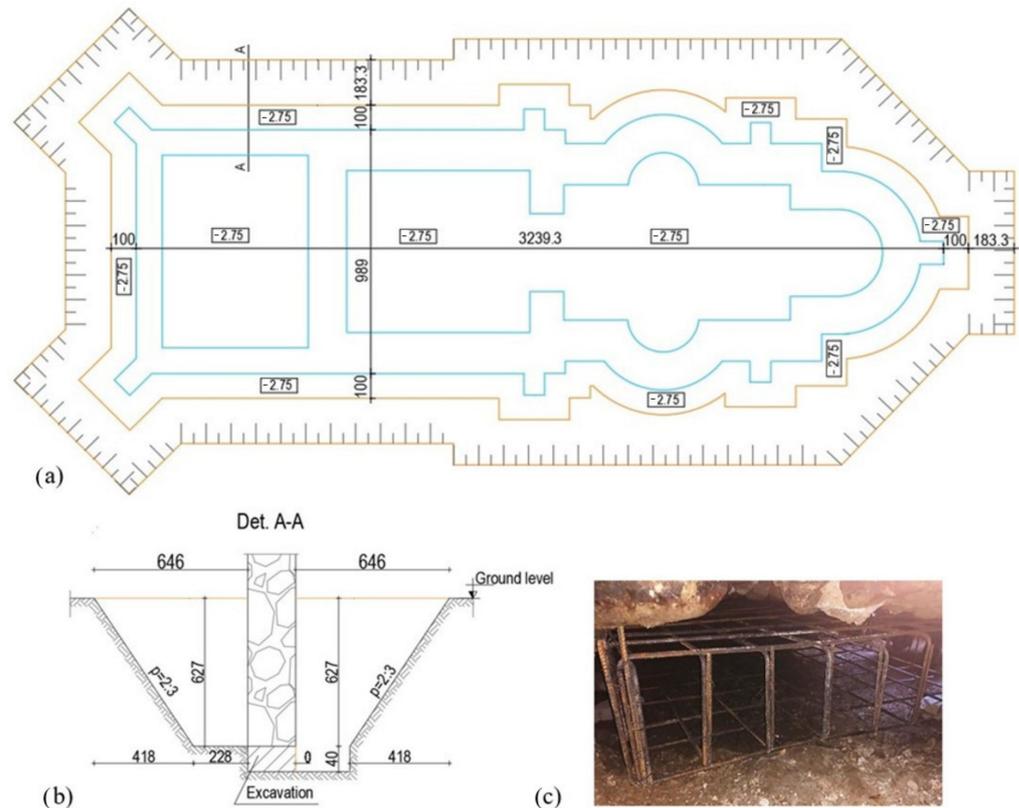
Reinforced concrete pads (a) Excavation plan, (b) Detail A-A, (c) Reinforcement of the pads (dimensions in cm).
